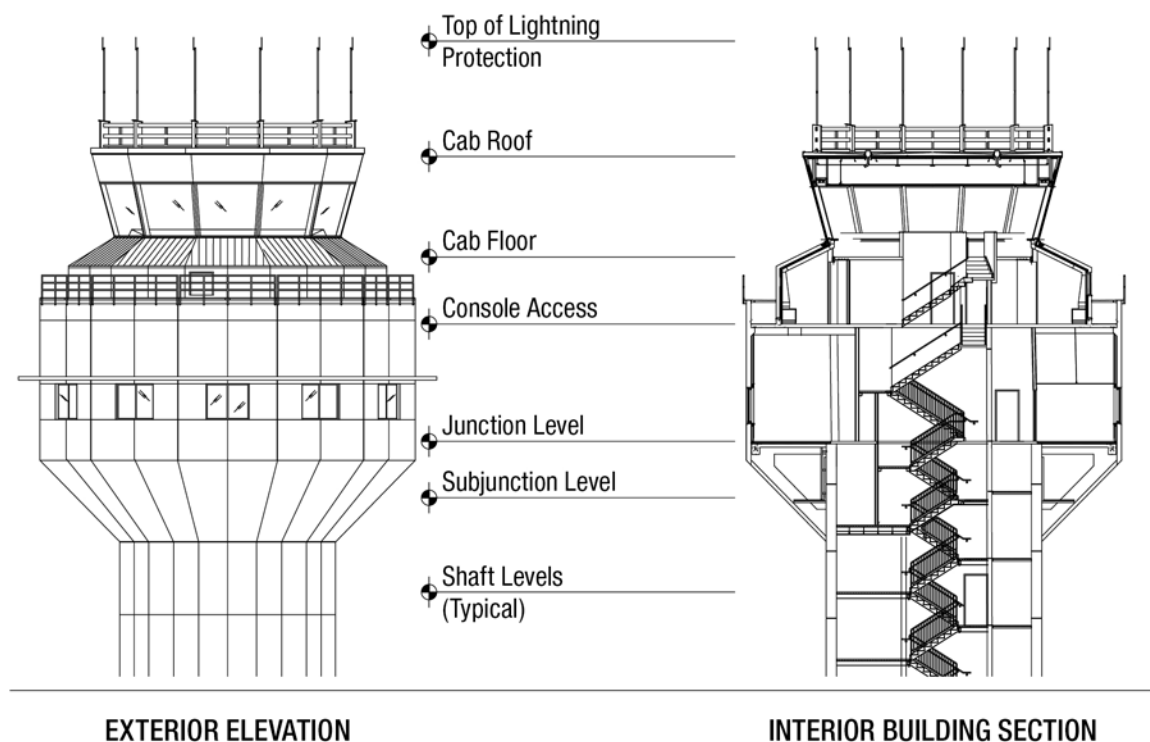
Airport Traffic Control Tower – Typical Floor Levels
